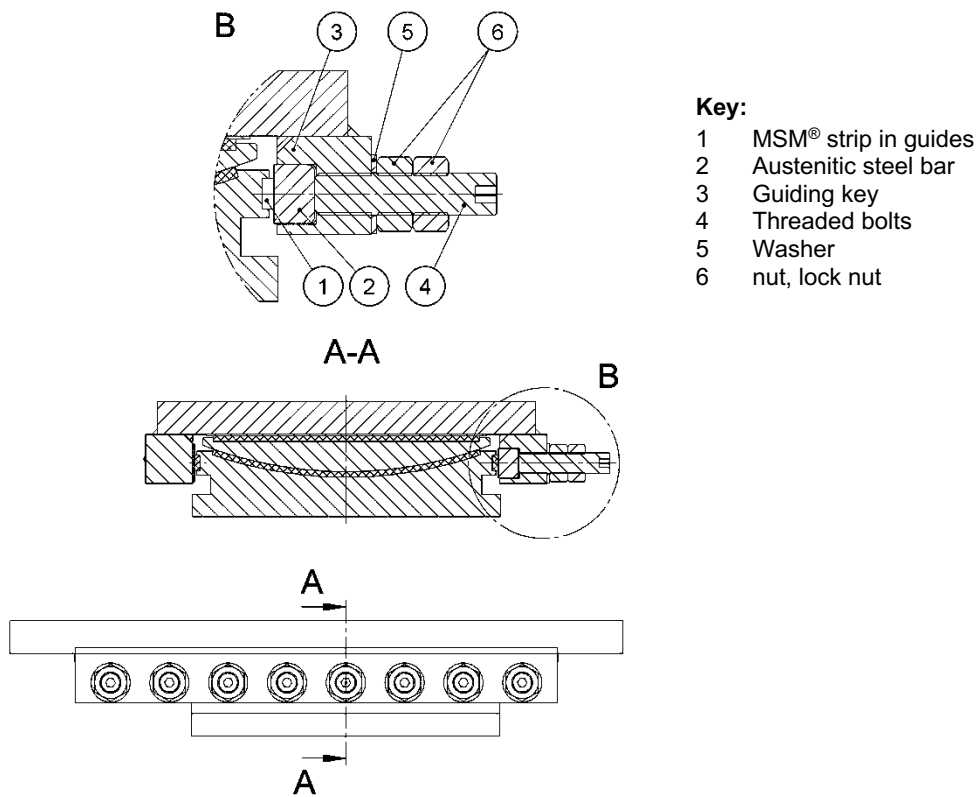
MAURER MSM® Spherical Segment Bearing (example)
